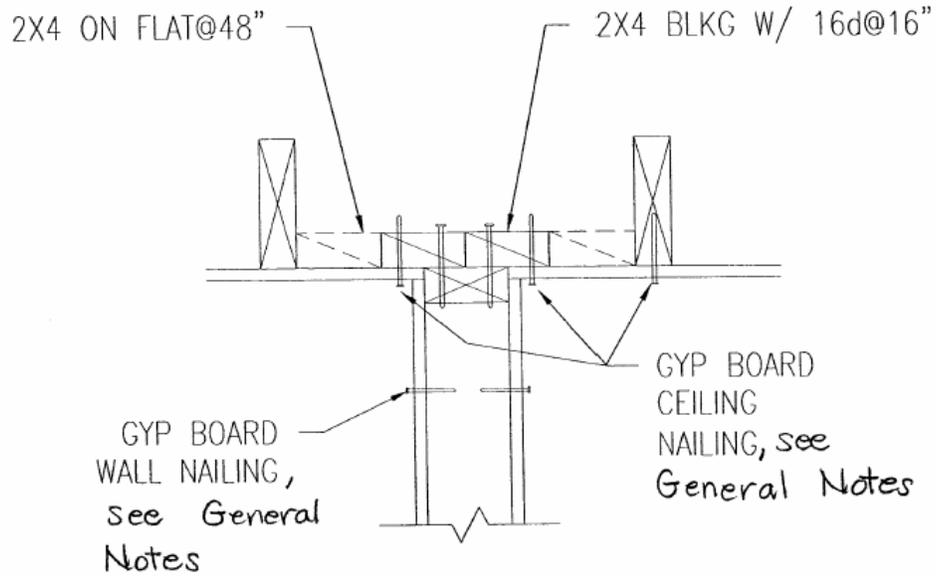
Index building 4 ceiling at partition parallel (detail 7-S2)
